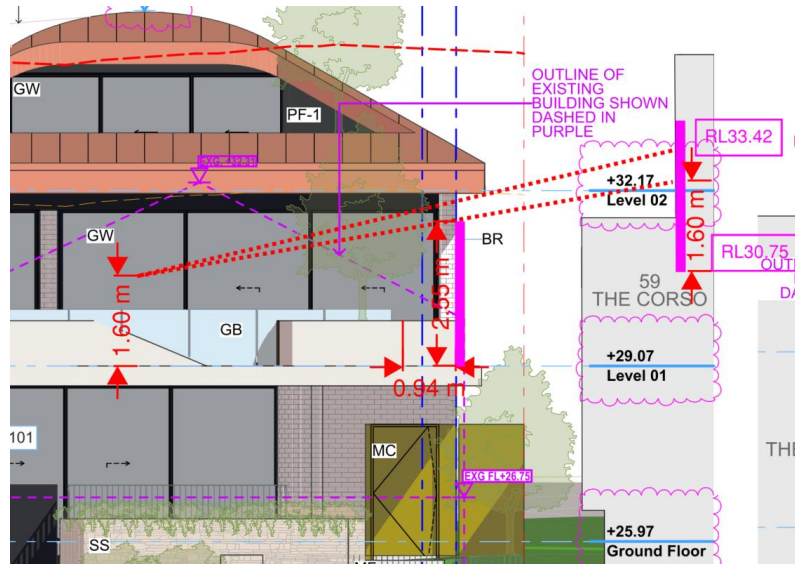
Proposed north-east elevation with sight lines in red and adjoining window in pink - 61 The Corso, Maroubra (Source: PopovBass)
